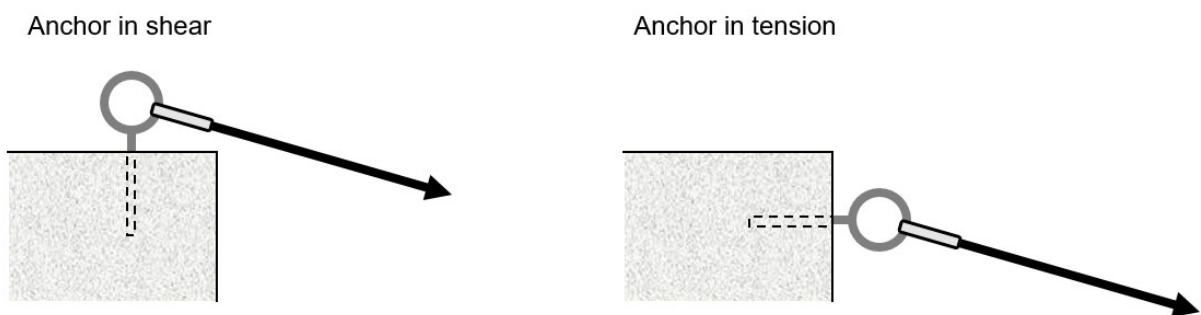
Single point anchorages – shear and tension defined
